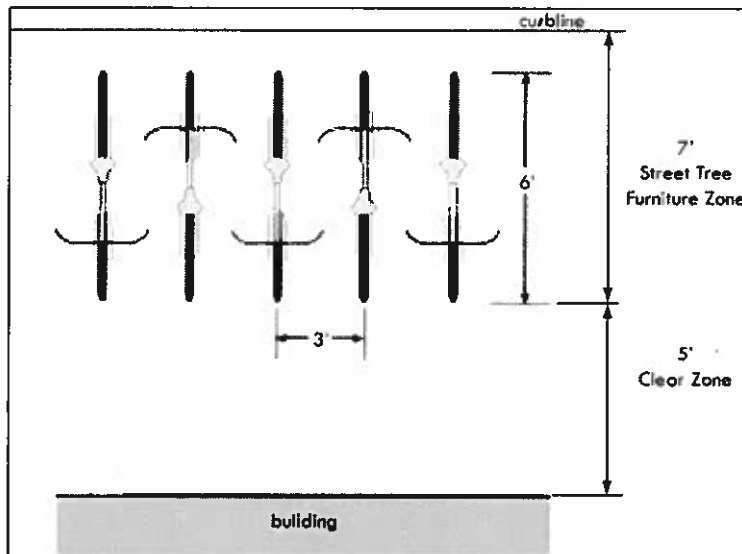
Bicycle parking design – Urban Roadway sidewalk example
